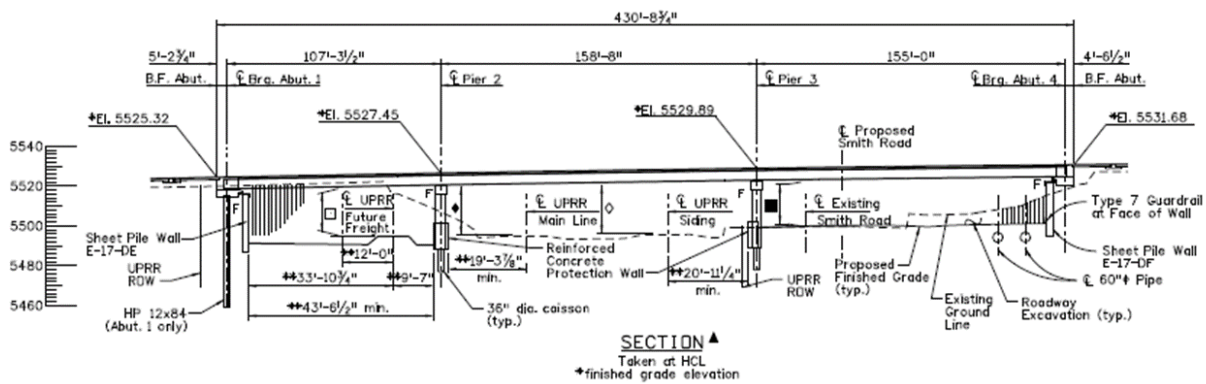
Diagram. General span layout for westbound bridge E-17-AEK.
